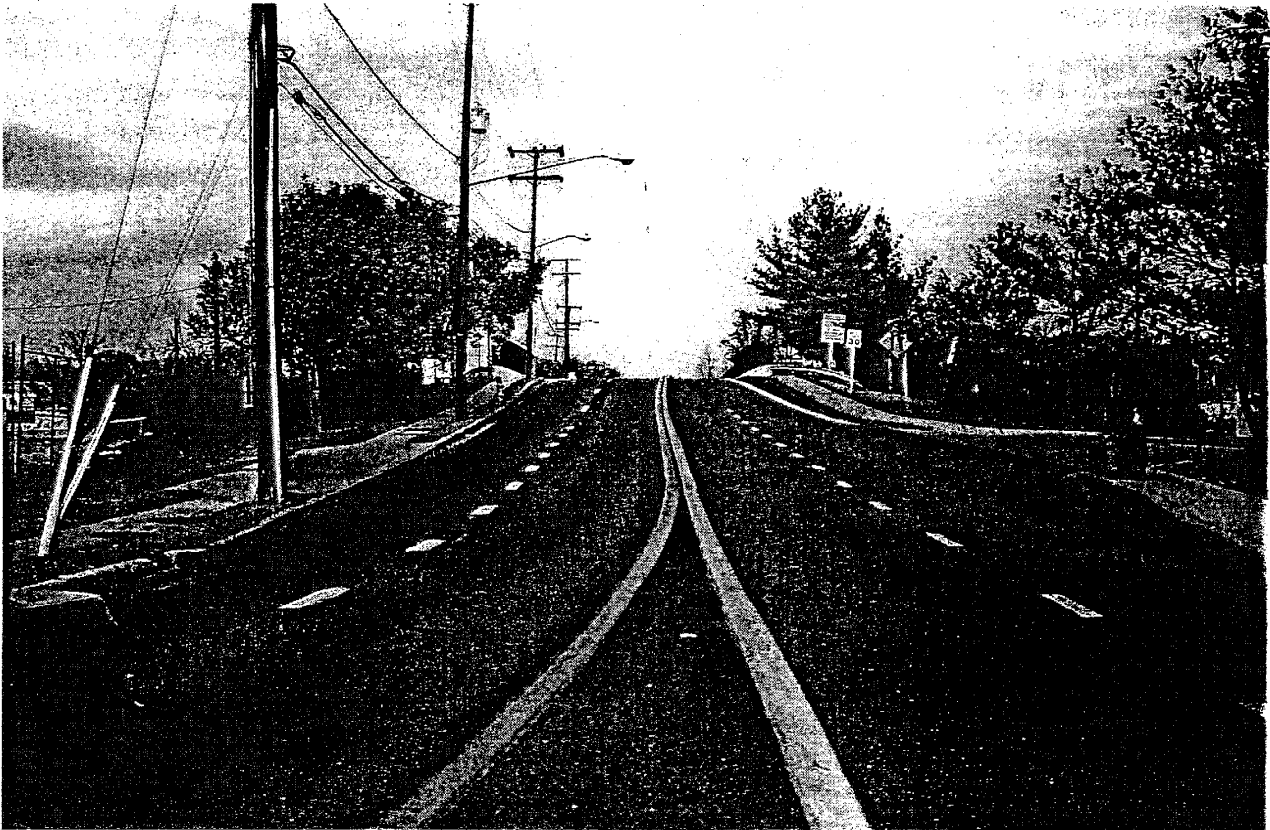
Burlington Avenue (MD 410) eastbound from intersection with Georgia Avenue.
